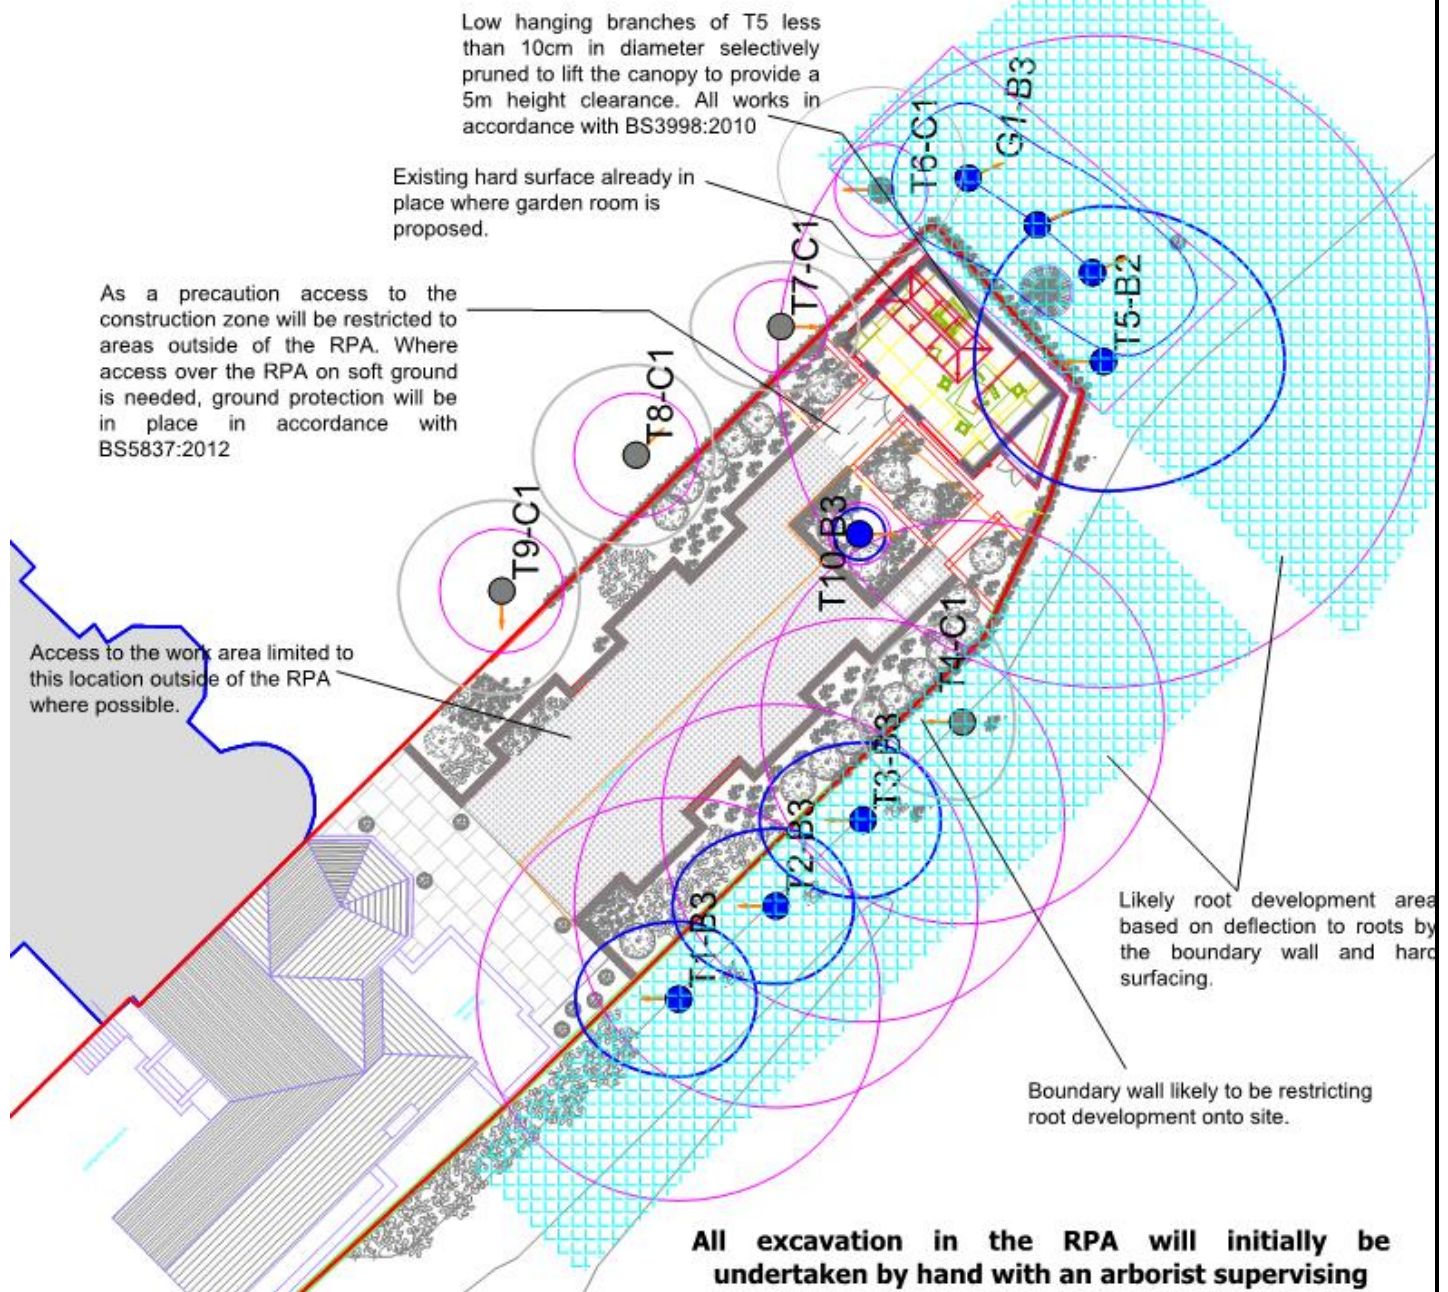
(above): Tree plan showing the T1 (Pear Tree)
